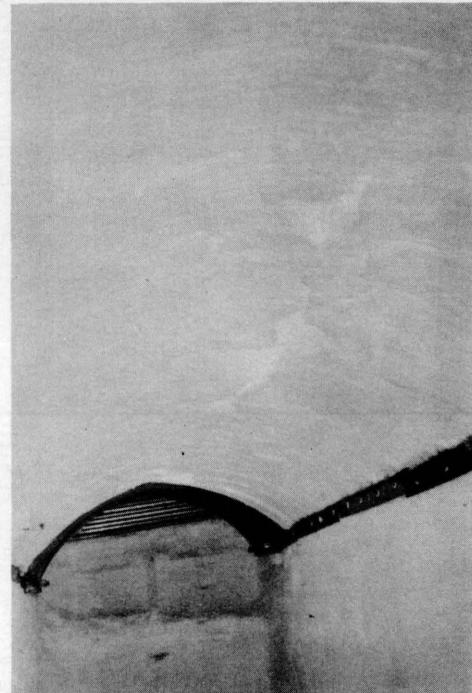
Interior of arch after shot 1, looking toward thin end of arch section. Note longitudinal crack which runs the length of the arch. (Blast side - right)
